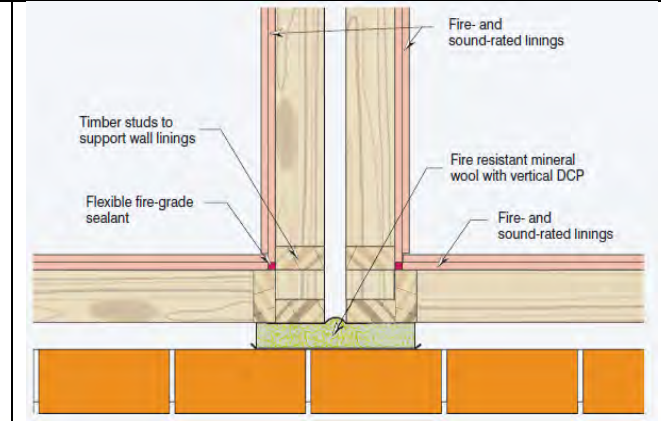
Wall / External Call Mineral Wool Cavity Barrier
